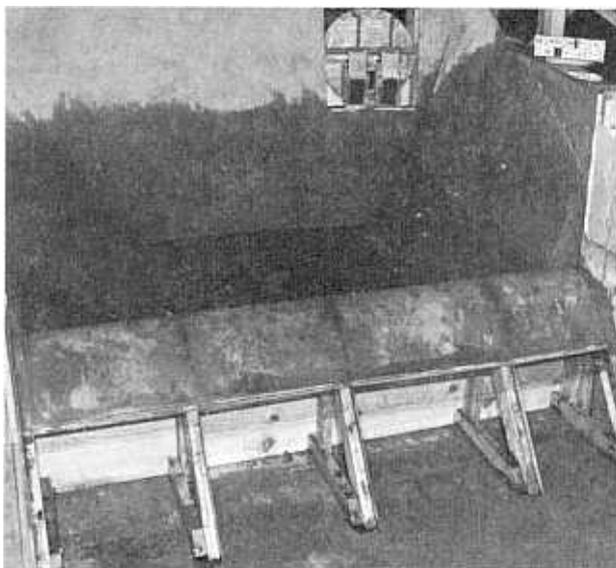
The preliminary model. Looking upstream at the weir, stilling basin, and outlet works.
